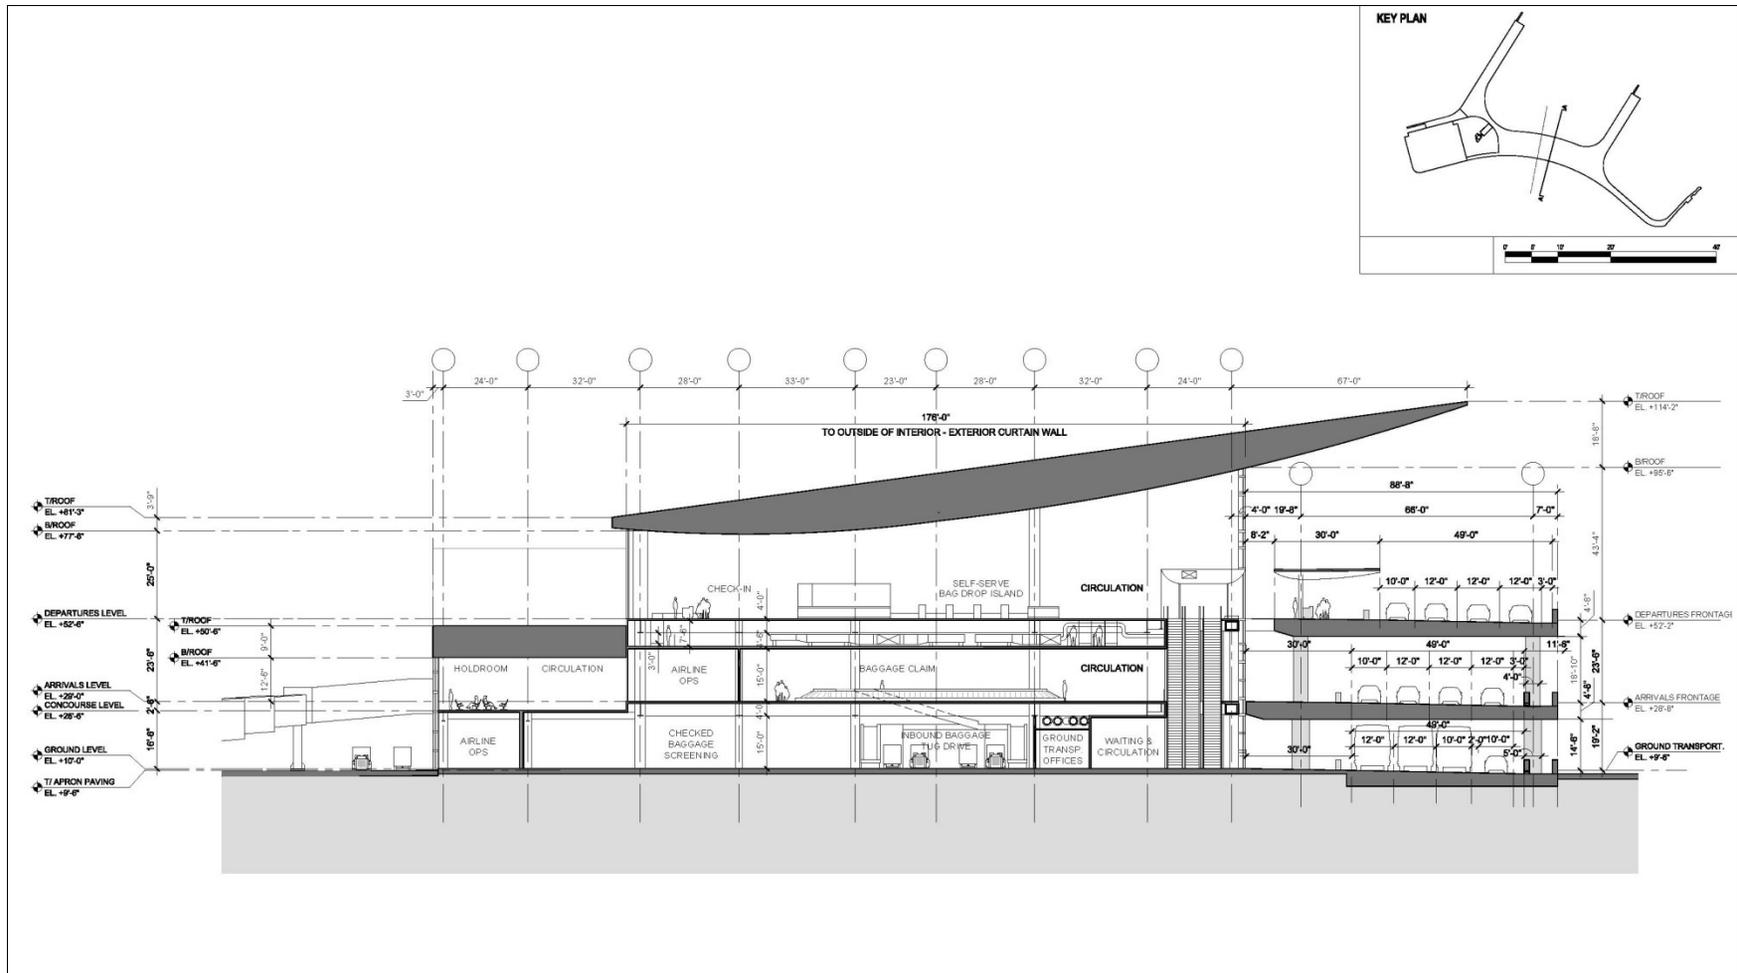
Section through Headhouse (at High Point) & Frontages
